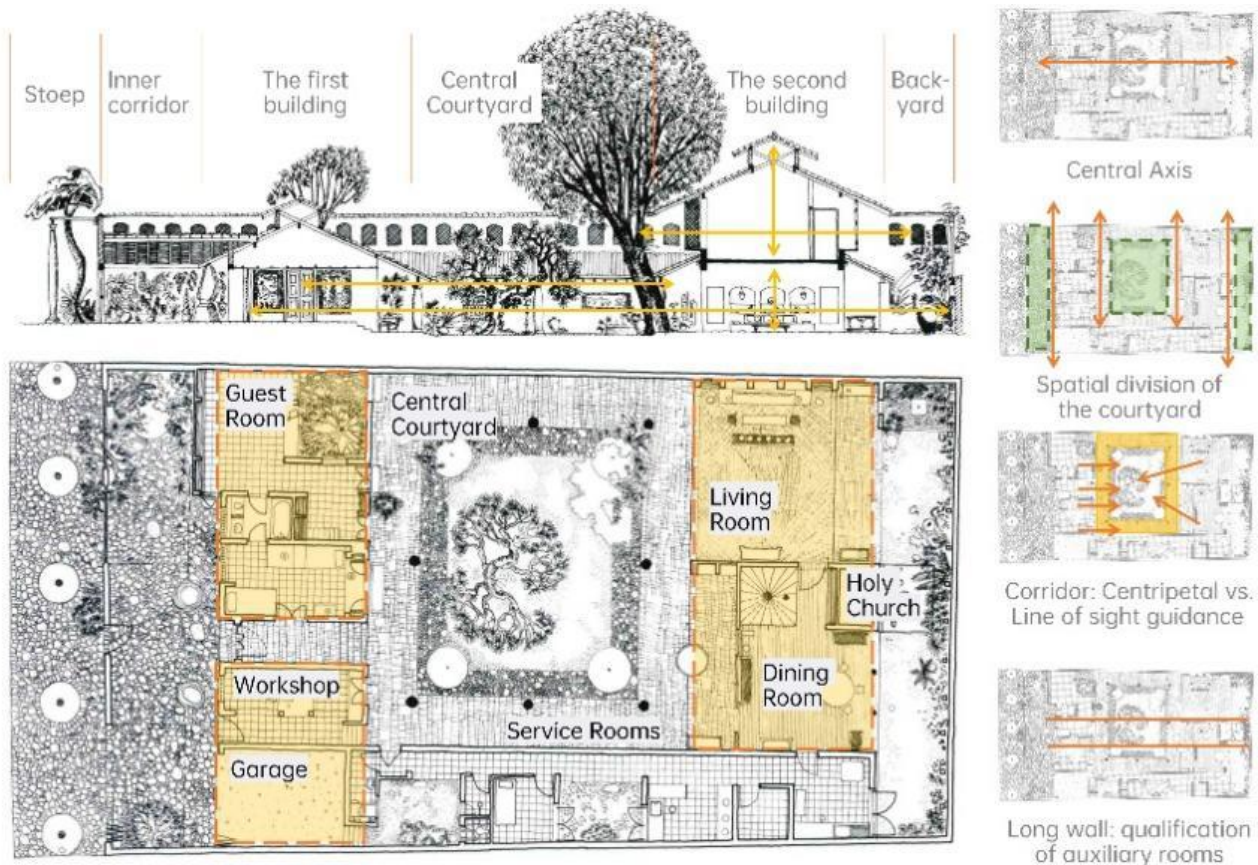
Section and plan of Ena de Silva House, redrawn by the author
